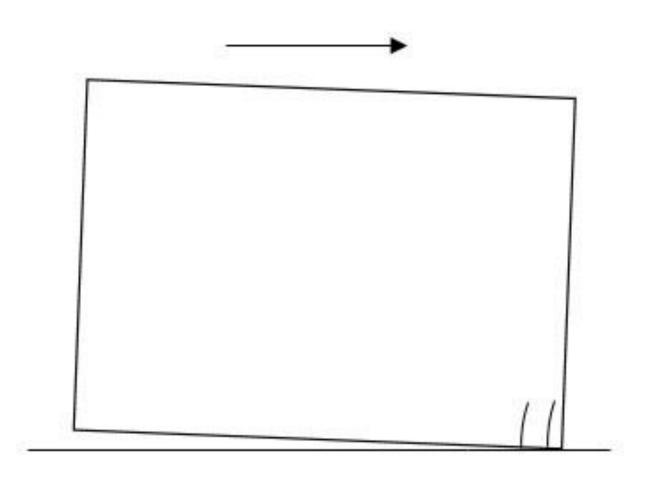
100 mm Unreinforced Masonry Wall Piers Failure Mode: In-plane sliding-vertical toe splitting cracking Cause: Poor unit, or joint mortar, compressive strength; bearing stress too low
